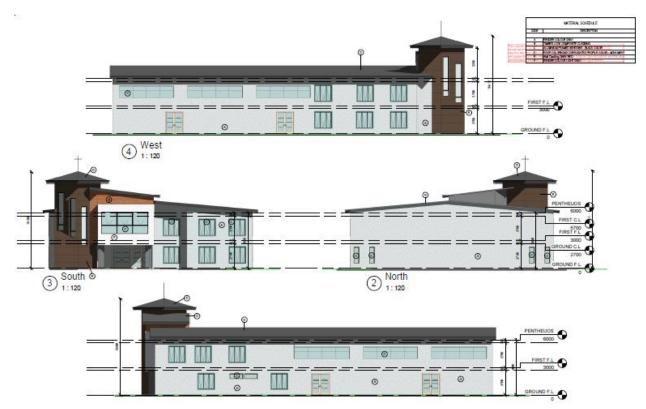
Elevation Plans (noting elevation labels are incorrect).
